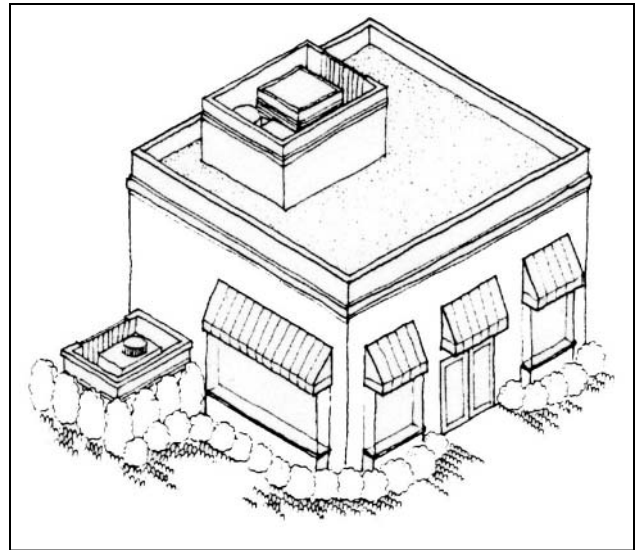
Parapets and roof screens help hide mechanical roof equipment.
